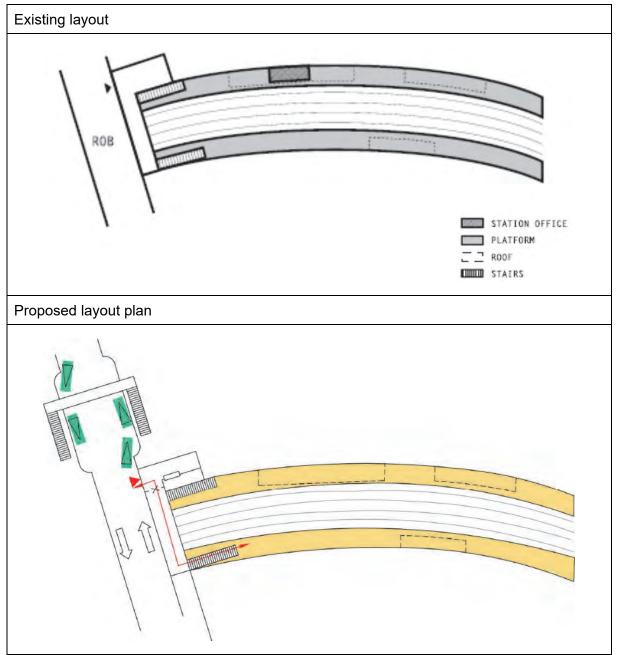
Existing and Proposed Layout Plan (Phaya Road Station)
